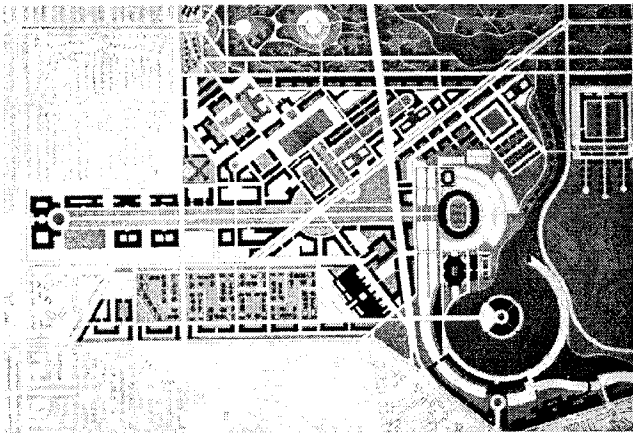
Plan showing the southwest section of the site to be used for government and event center, hotel, public facilities, and wellness center.
